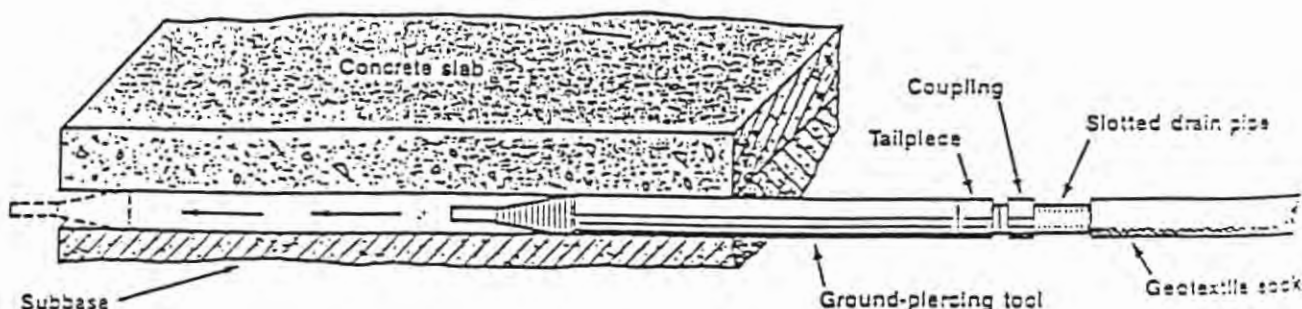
Retrofit Installation of Drain Pipe Below Transverse Joints and Cracks (13).
